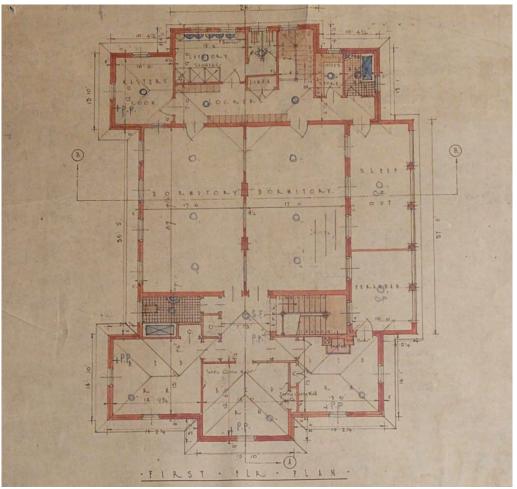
First floor plan for 'Proposed New Dormitory Block, Barker College, Hornsby,' prepared by Howard Joseland, architect, and signed 25 October 1928 to mark the plan as part of the agreement with the contractor, J. Harper. (Source: Barker College Archives, Plan M0008).
